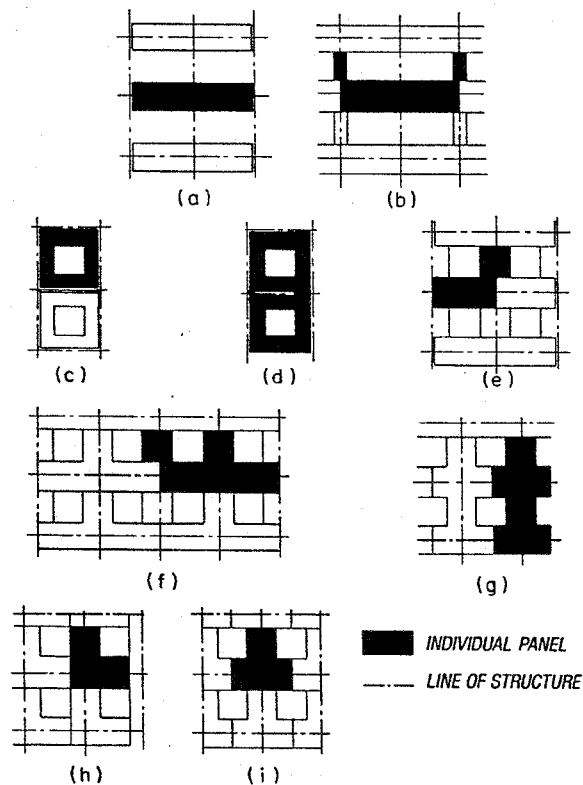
Typical arrangements of precast concrete panels (from PCI [1989]).
